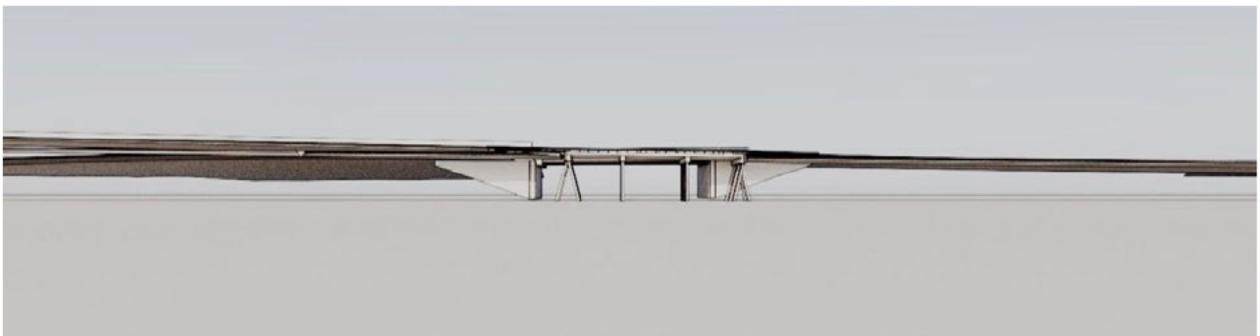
White card model of Cam River Bridges, looking east (new bridge behind existing bridge)
